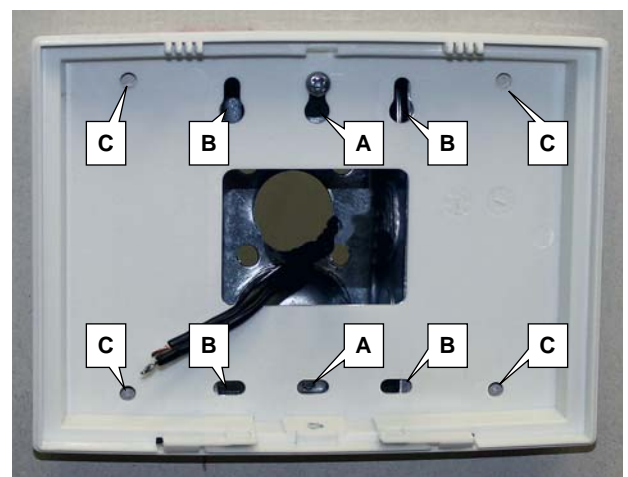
Rear housing mounting holes for single-gang (A) and double-gang (B) electrical boxes, and four all-purpose holes
